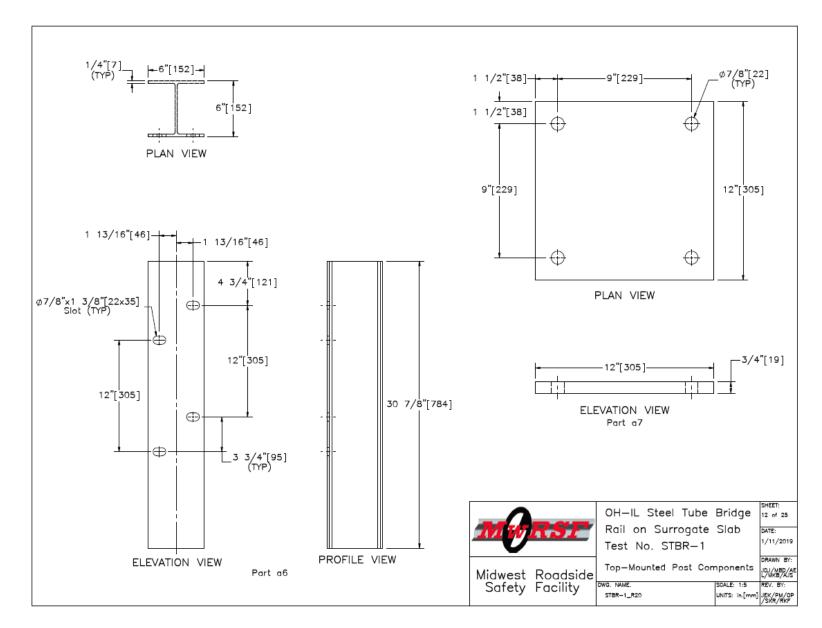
Top-Mounted Post Components, Test No. STBR-1
